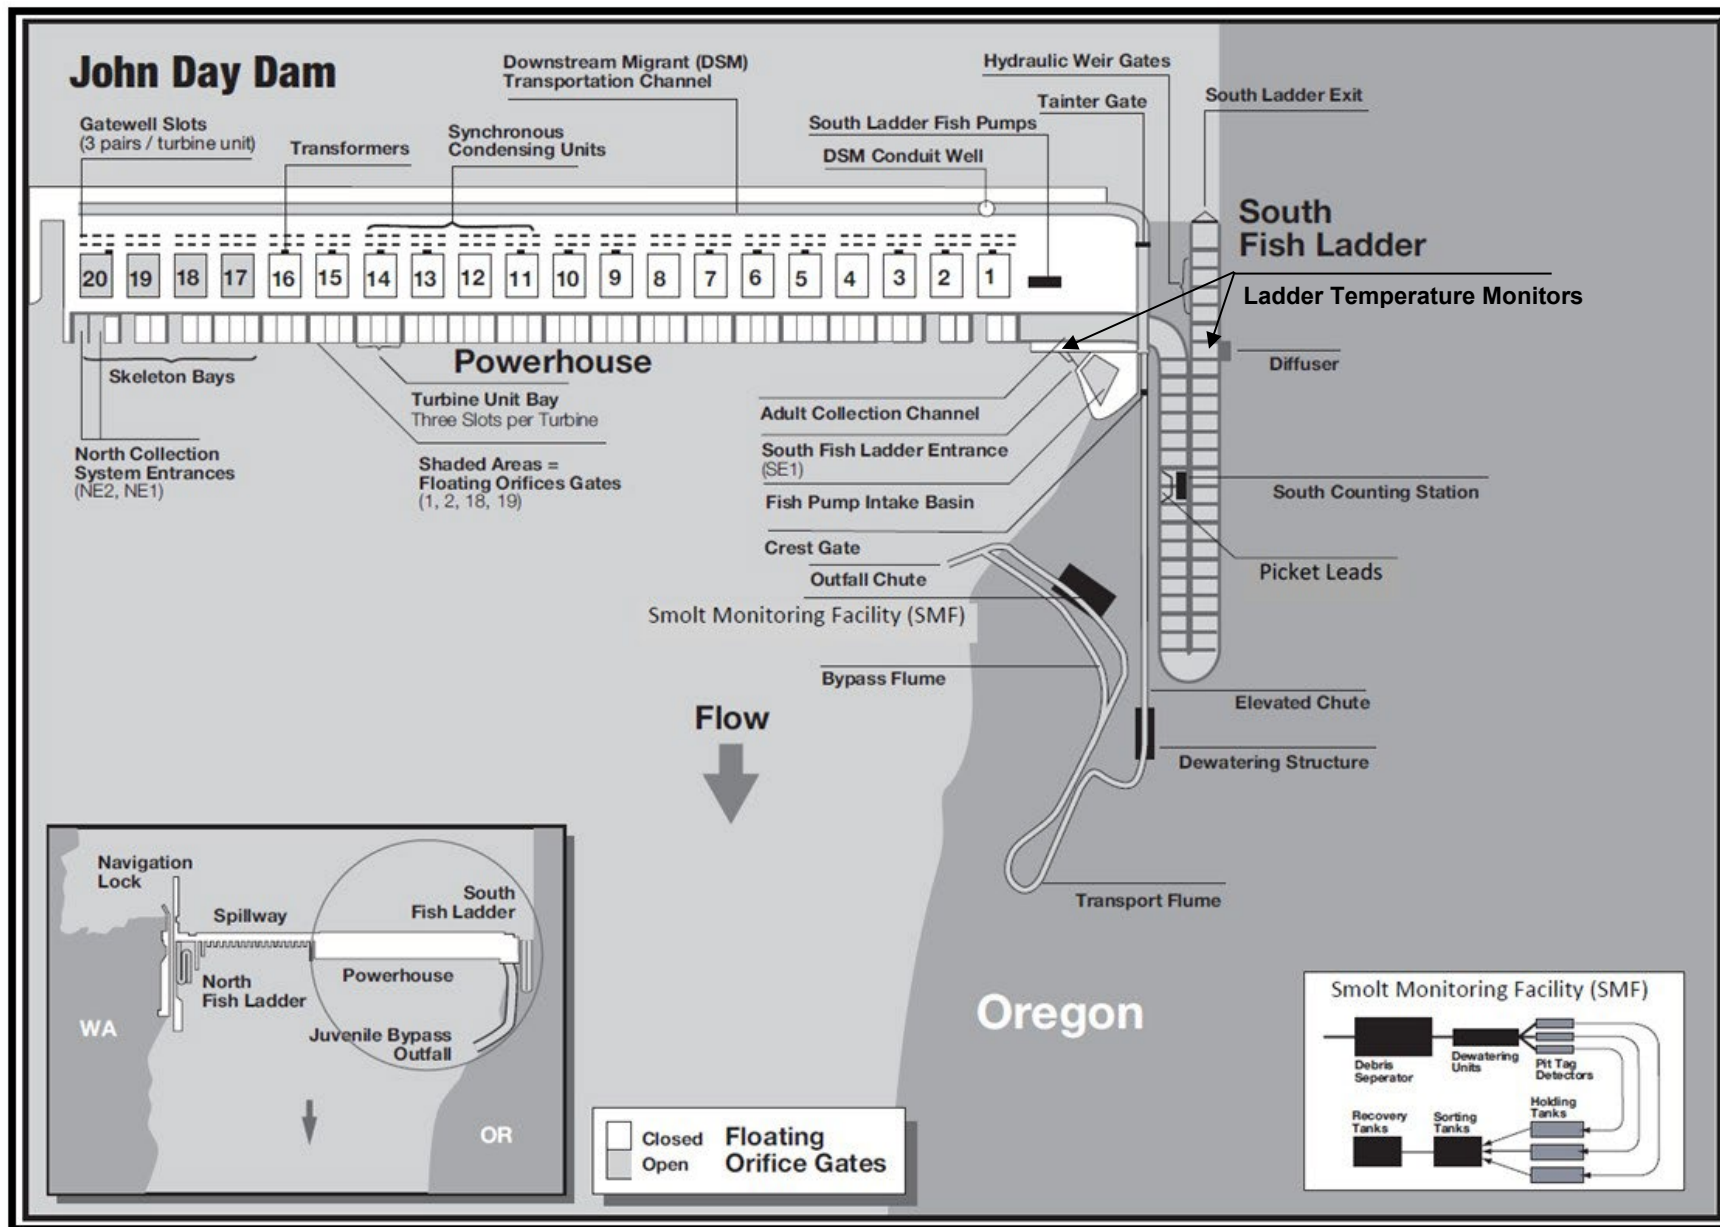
John Day Dam South Fish Ladder, Powerhouse Collection System, and Juvenile Bypass System.
